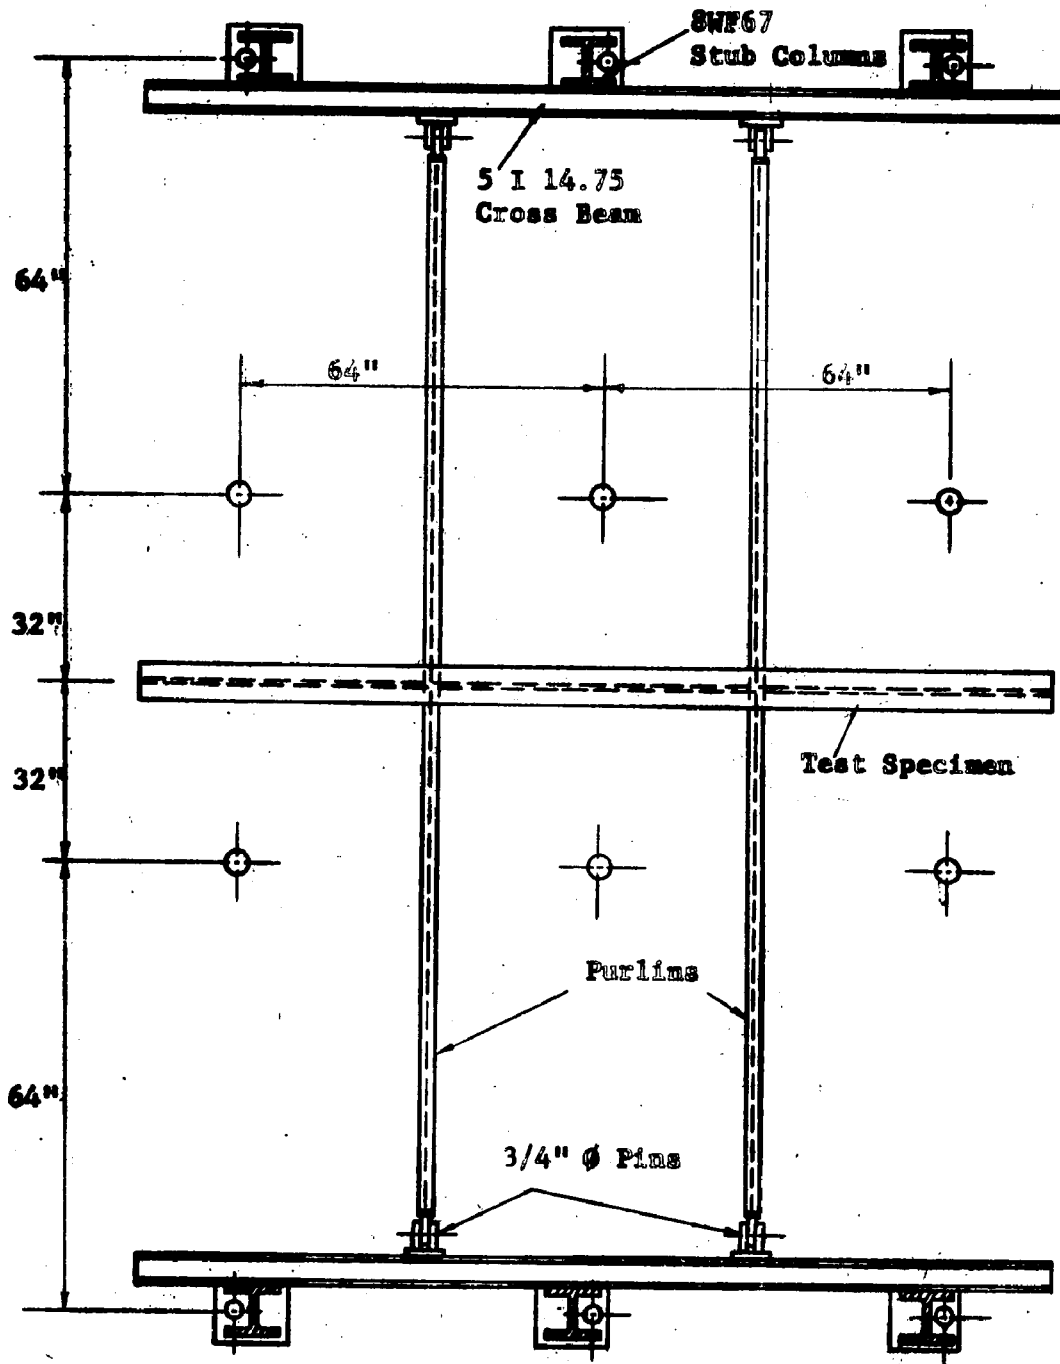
(a) PLAN VIEW OF THE BEAM-PURLIN ASSEMBLY
